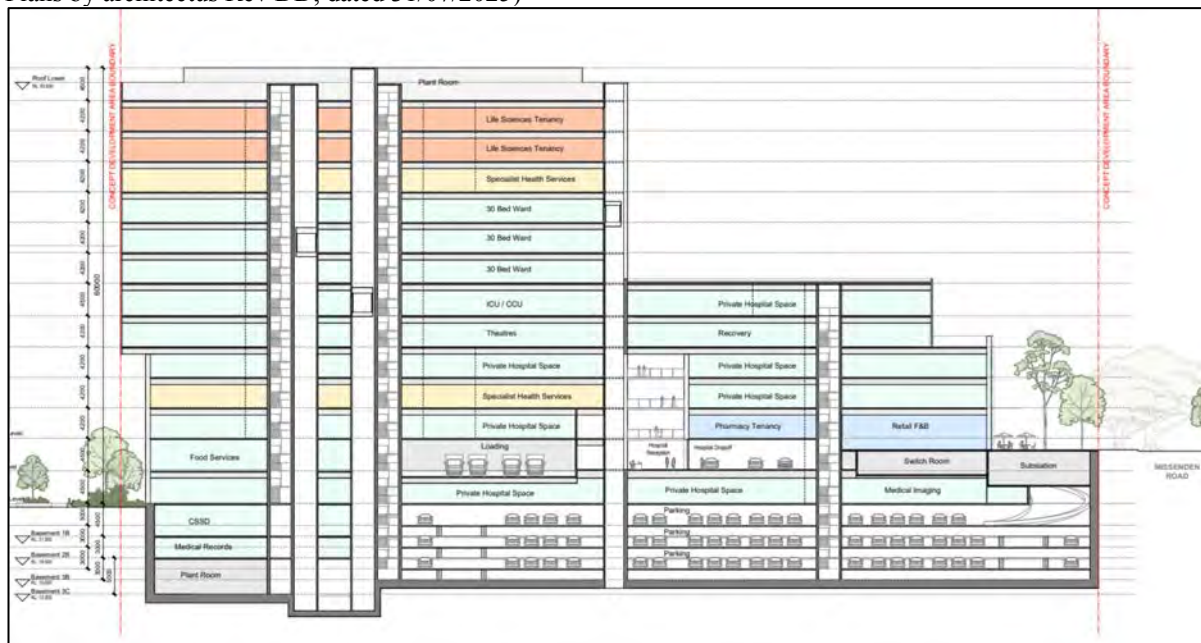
The proposed section plan. (Source: Section East /West Plan from Preliminary Plans by architectus Rev DD, dated 31/07/2025)
